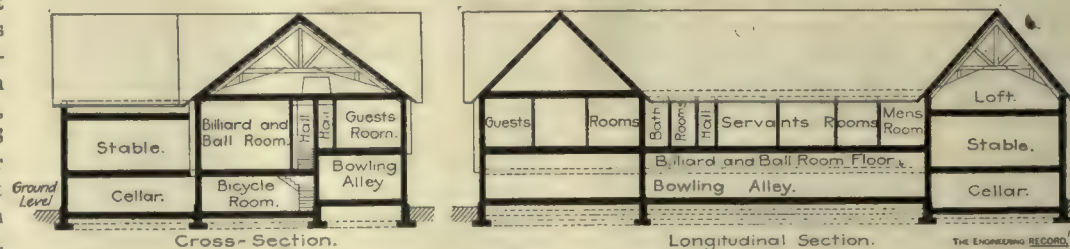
SECTIONS OF THE NEW BUILDING.
